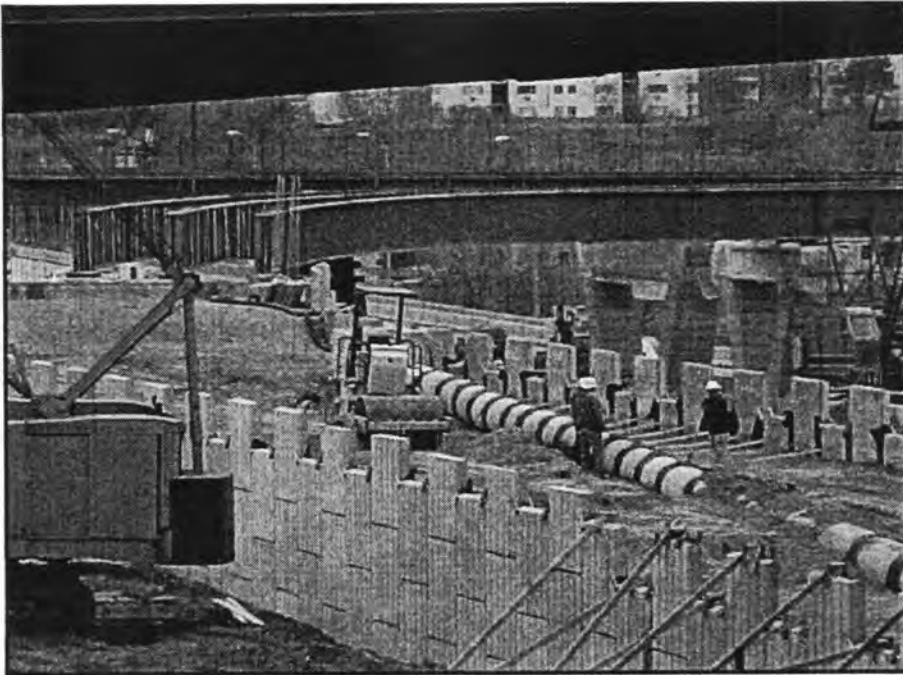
Picture showing MSE Wall at 2nd St Ave. Bridge
